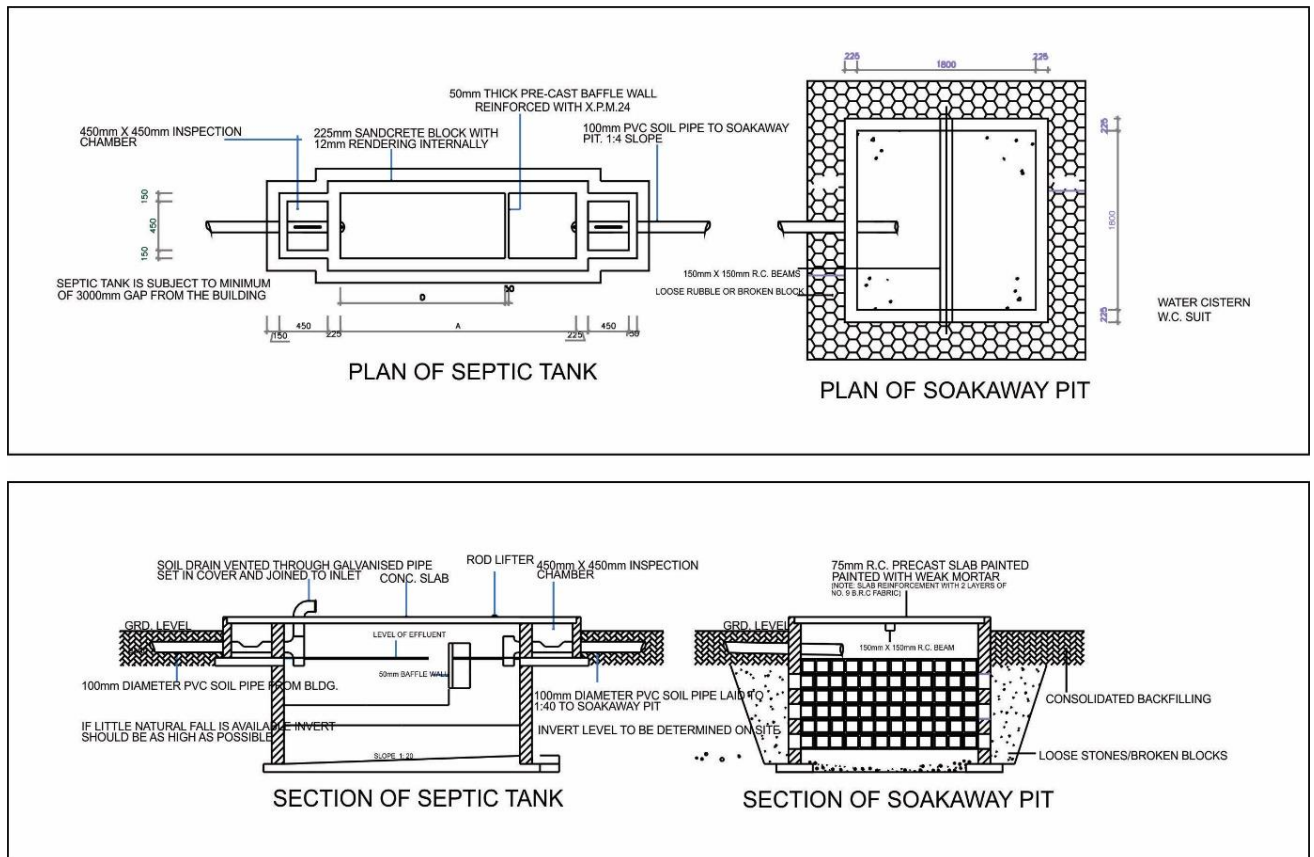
Plans and sections of a typical Septic tank and Soakaway pit in Nigeria. Source: Author's Archives.
